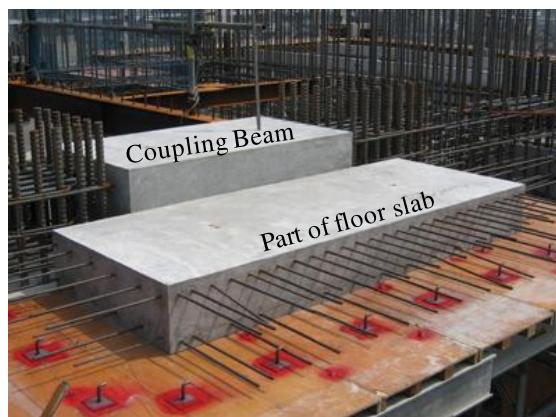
Precast ECC coupling beam dropped into location during building construction (Kanda et al., 2011)
